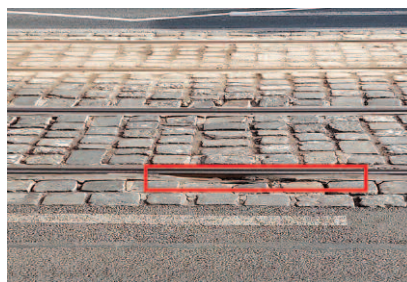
Tram tracks loaded with road traffic, collapsed stone blocks, Świdnicka Street on the section from Podwale Street to Kościuszki Square (12/2023)
